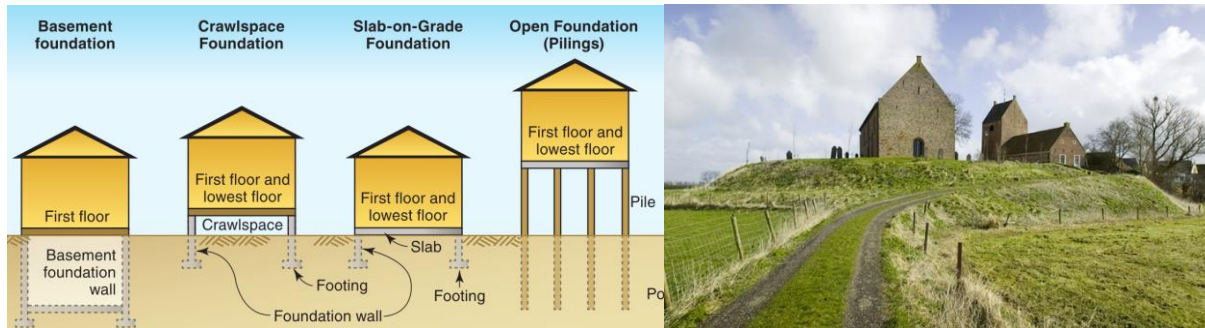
[Left] typical foundation options for elevating buildings as a retrofit from FEMA (2014) and [right] a Dutch terp mound from Cornell et al. (2018).
